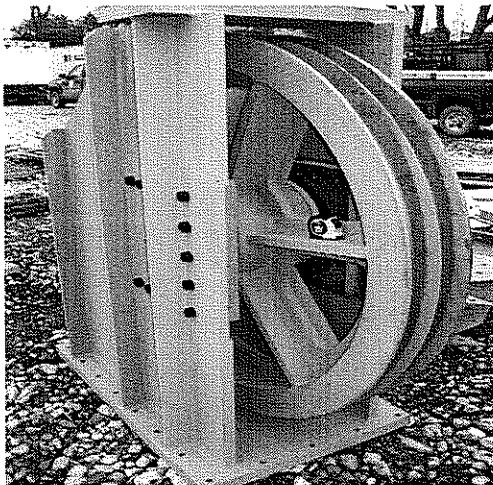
Deflector sheaves at West 3<sup>rd</sup> Street in Cleveland, Ohio
